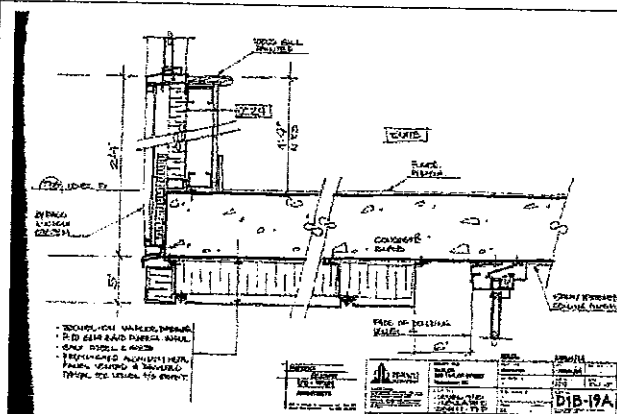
Soffit insulation Detail D1B-19A.
